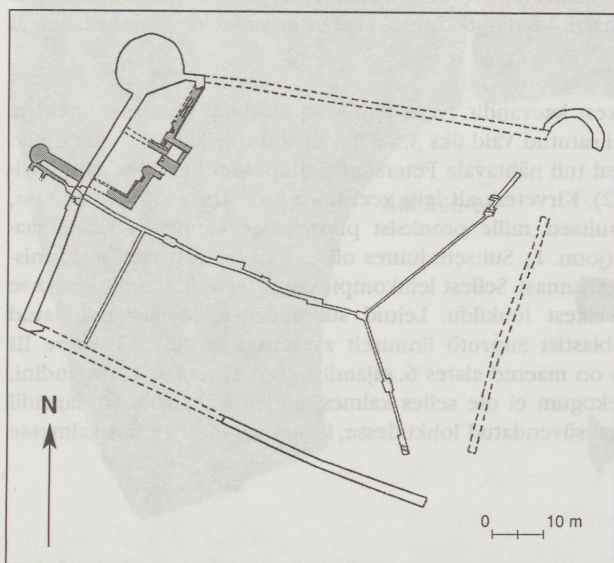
The castle of Laiuse, the cable track and the excavated part of the wall.
